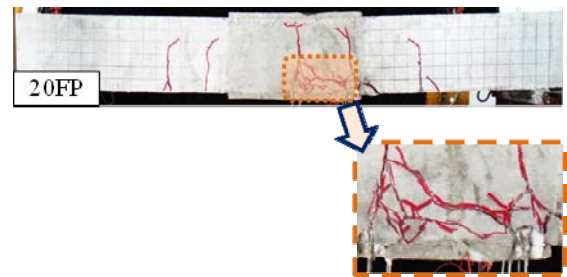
Crack pattern of specimens retrofitted by ferrocement jacket without skeleton steel (observed on main beam)
